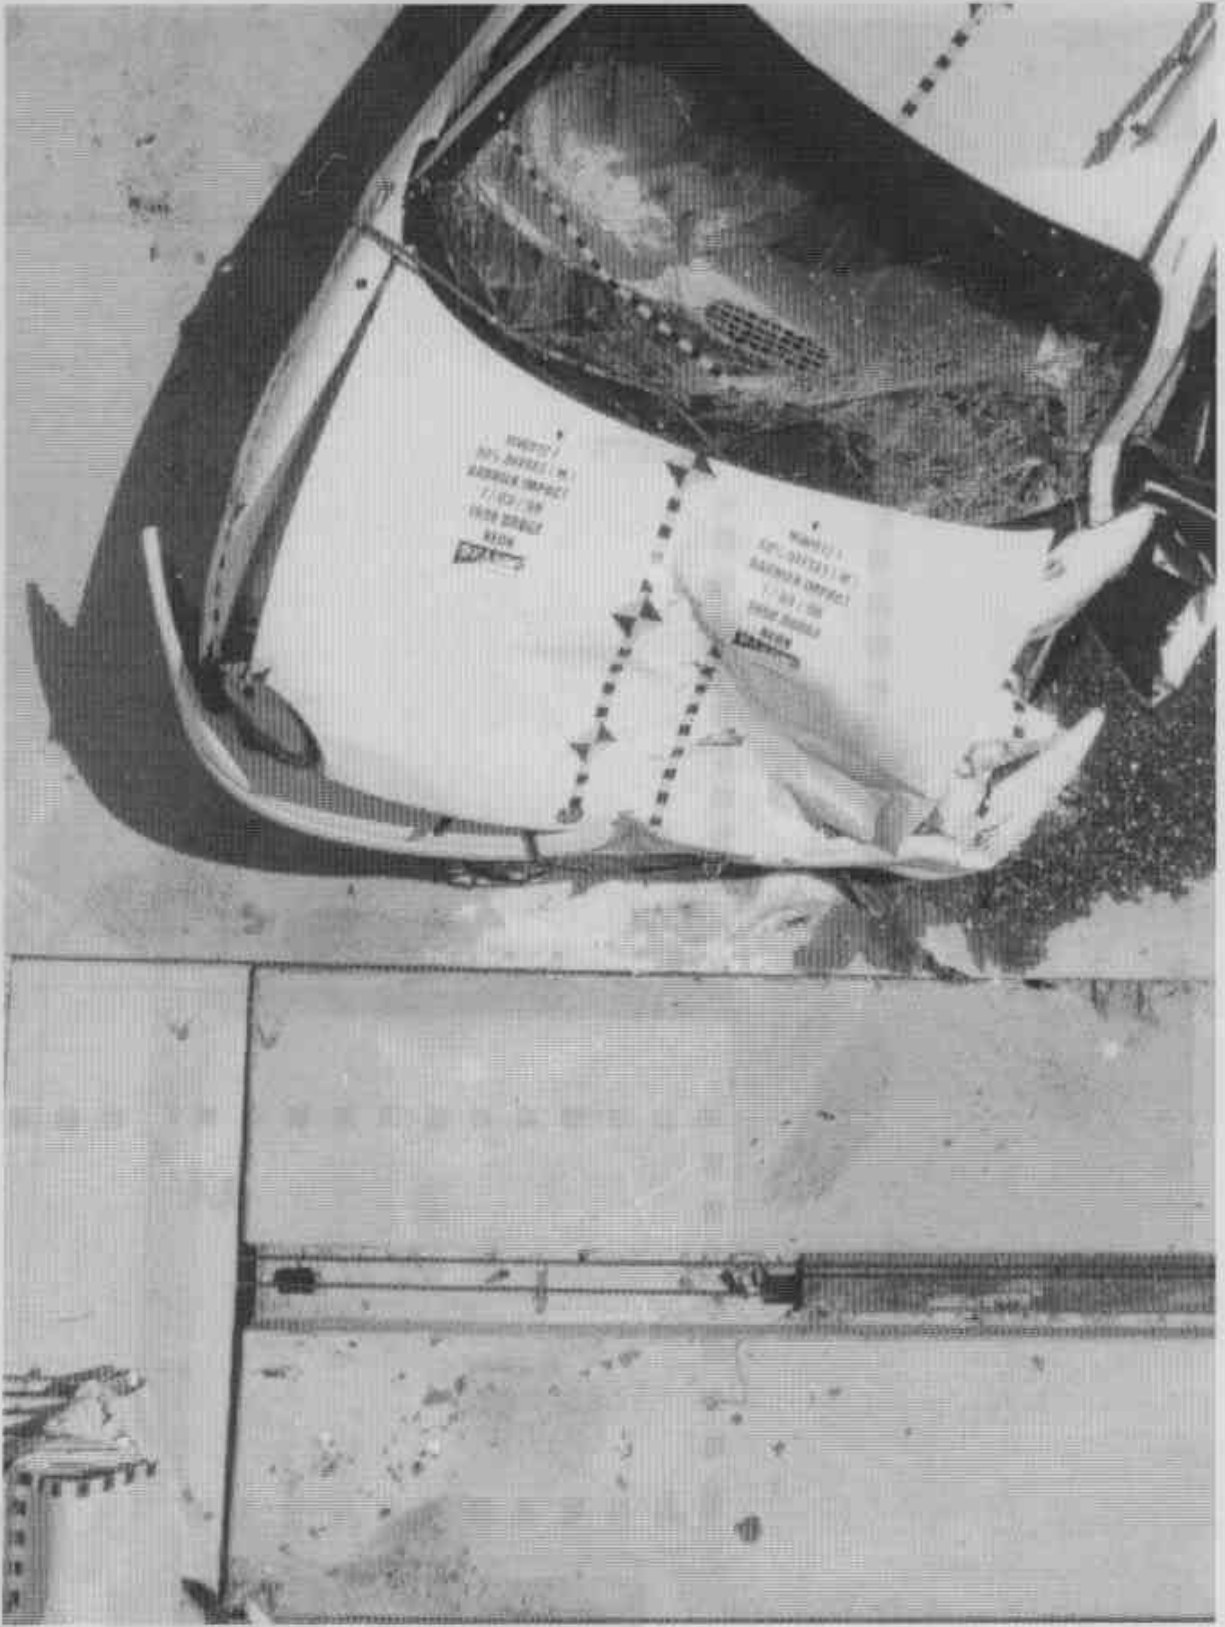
POST-TEST OVERHEAD CLOSE-UP
